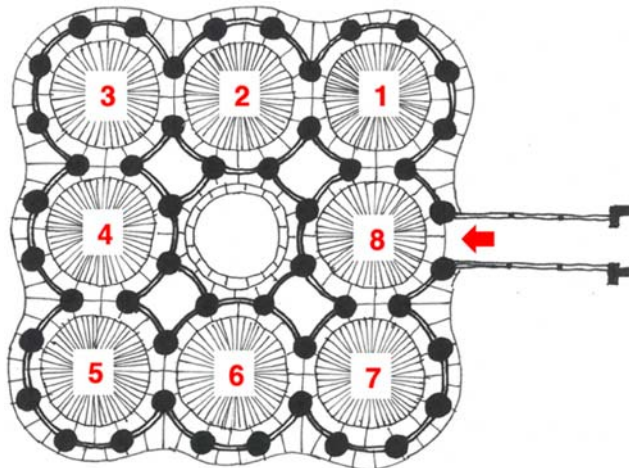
Floor plan. Source: Drawing by Stephanie Travis, 2020.
